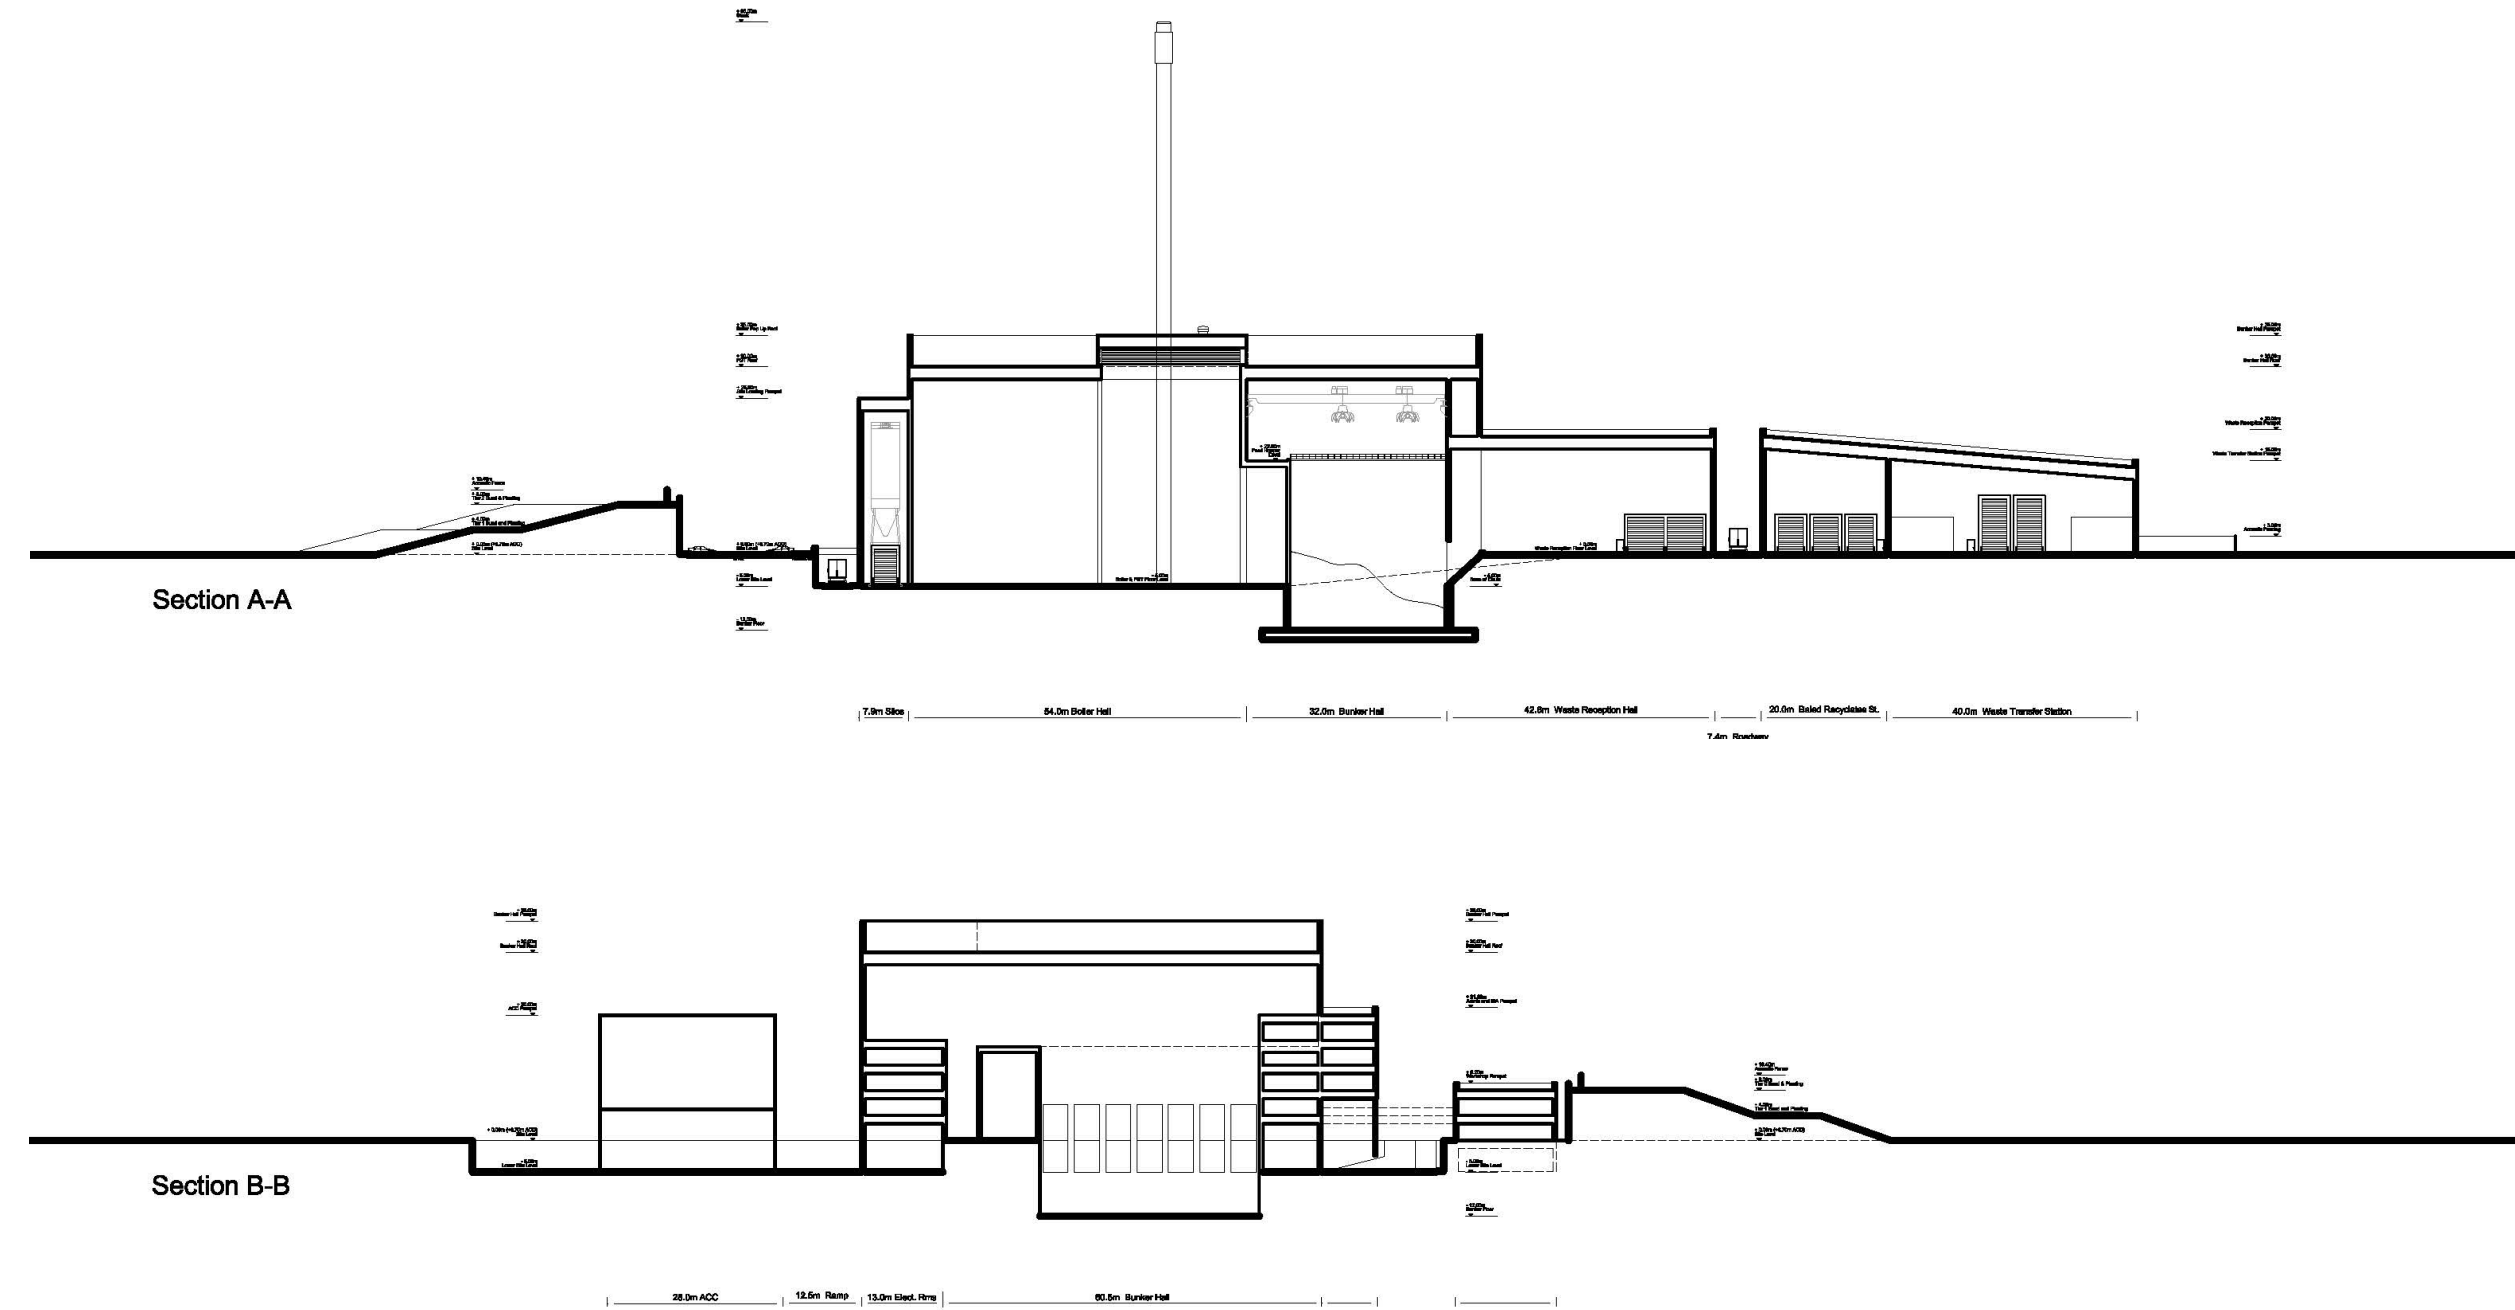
Initial site sections – lower development level assumed at -5mbgl
